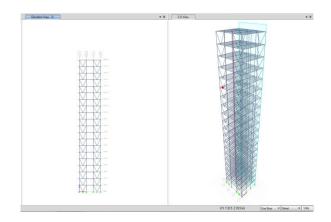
Elevation and 3D view of the building with V bracings at outer bays
